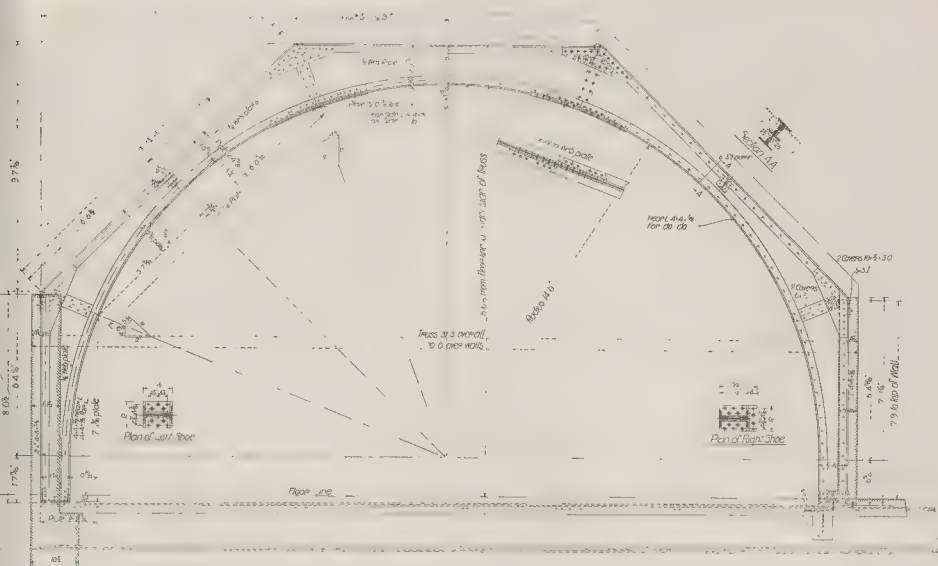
Arched Truss in Roof over Chemistry Laboratory.
